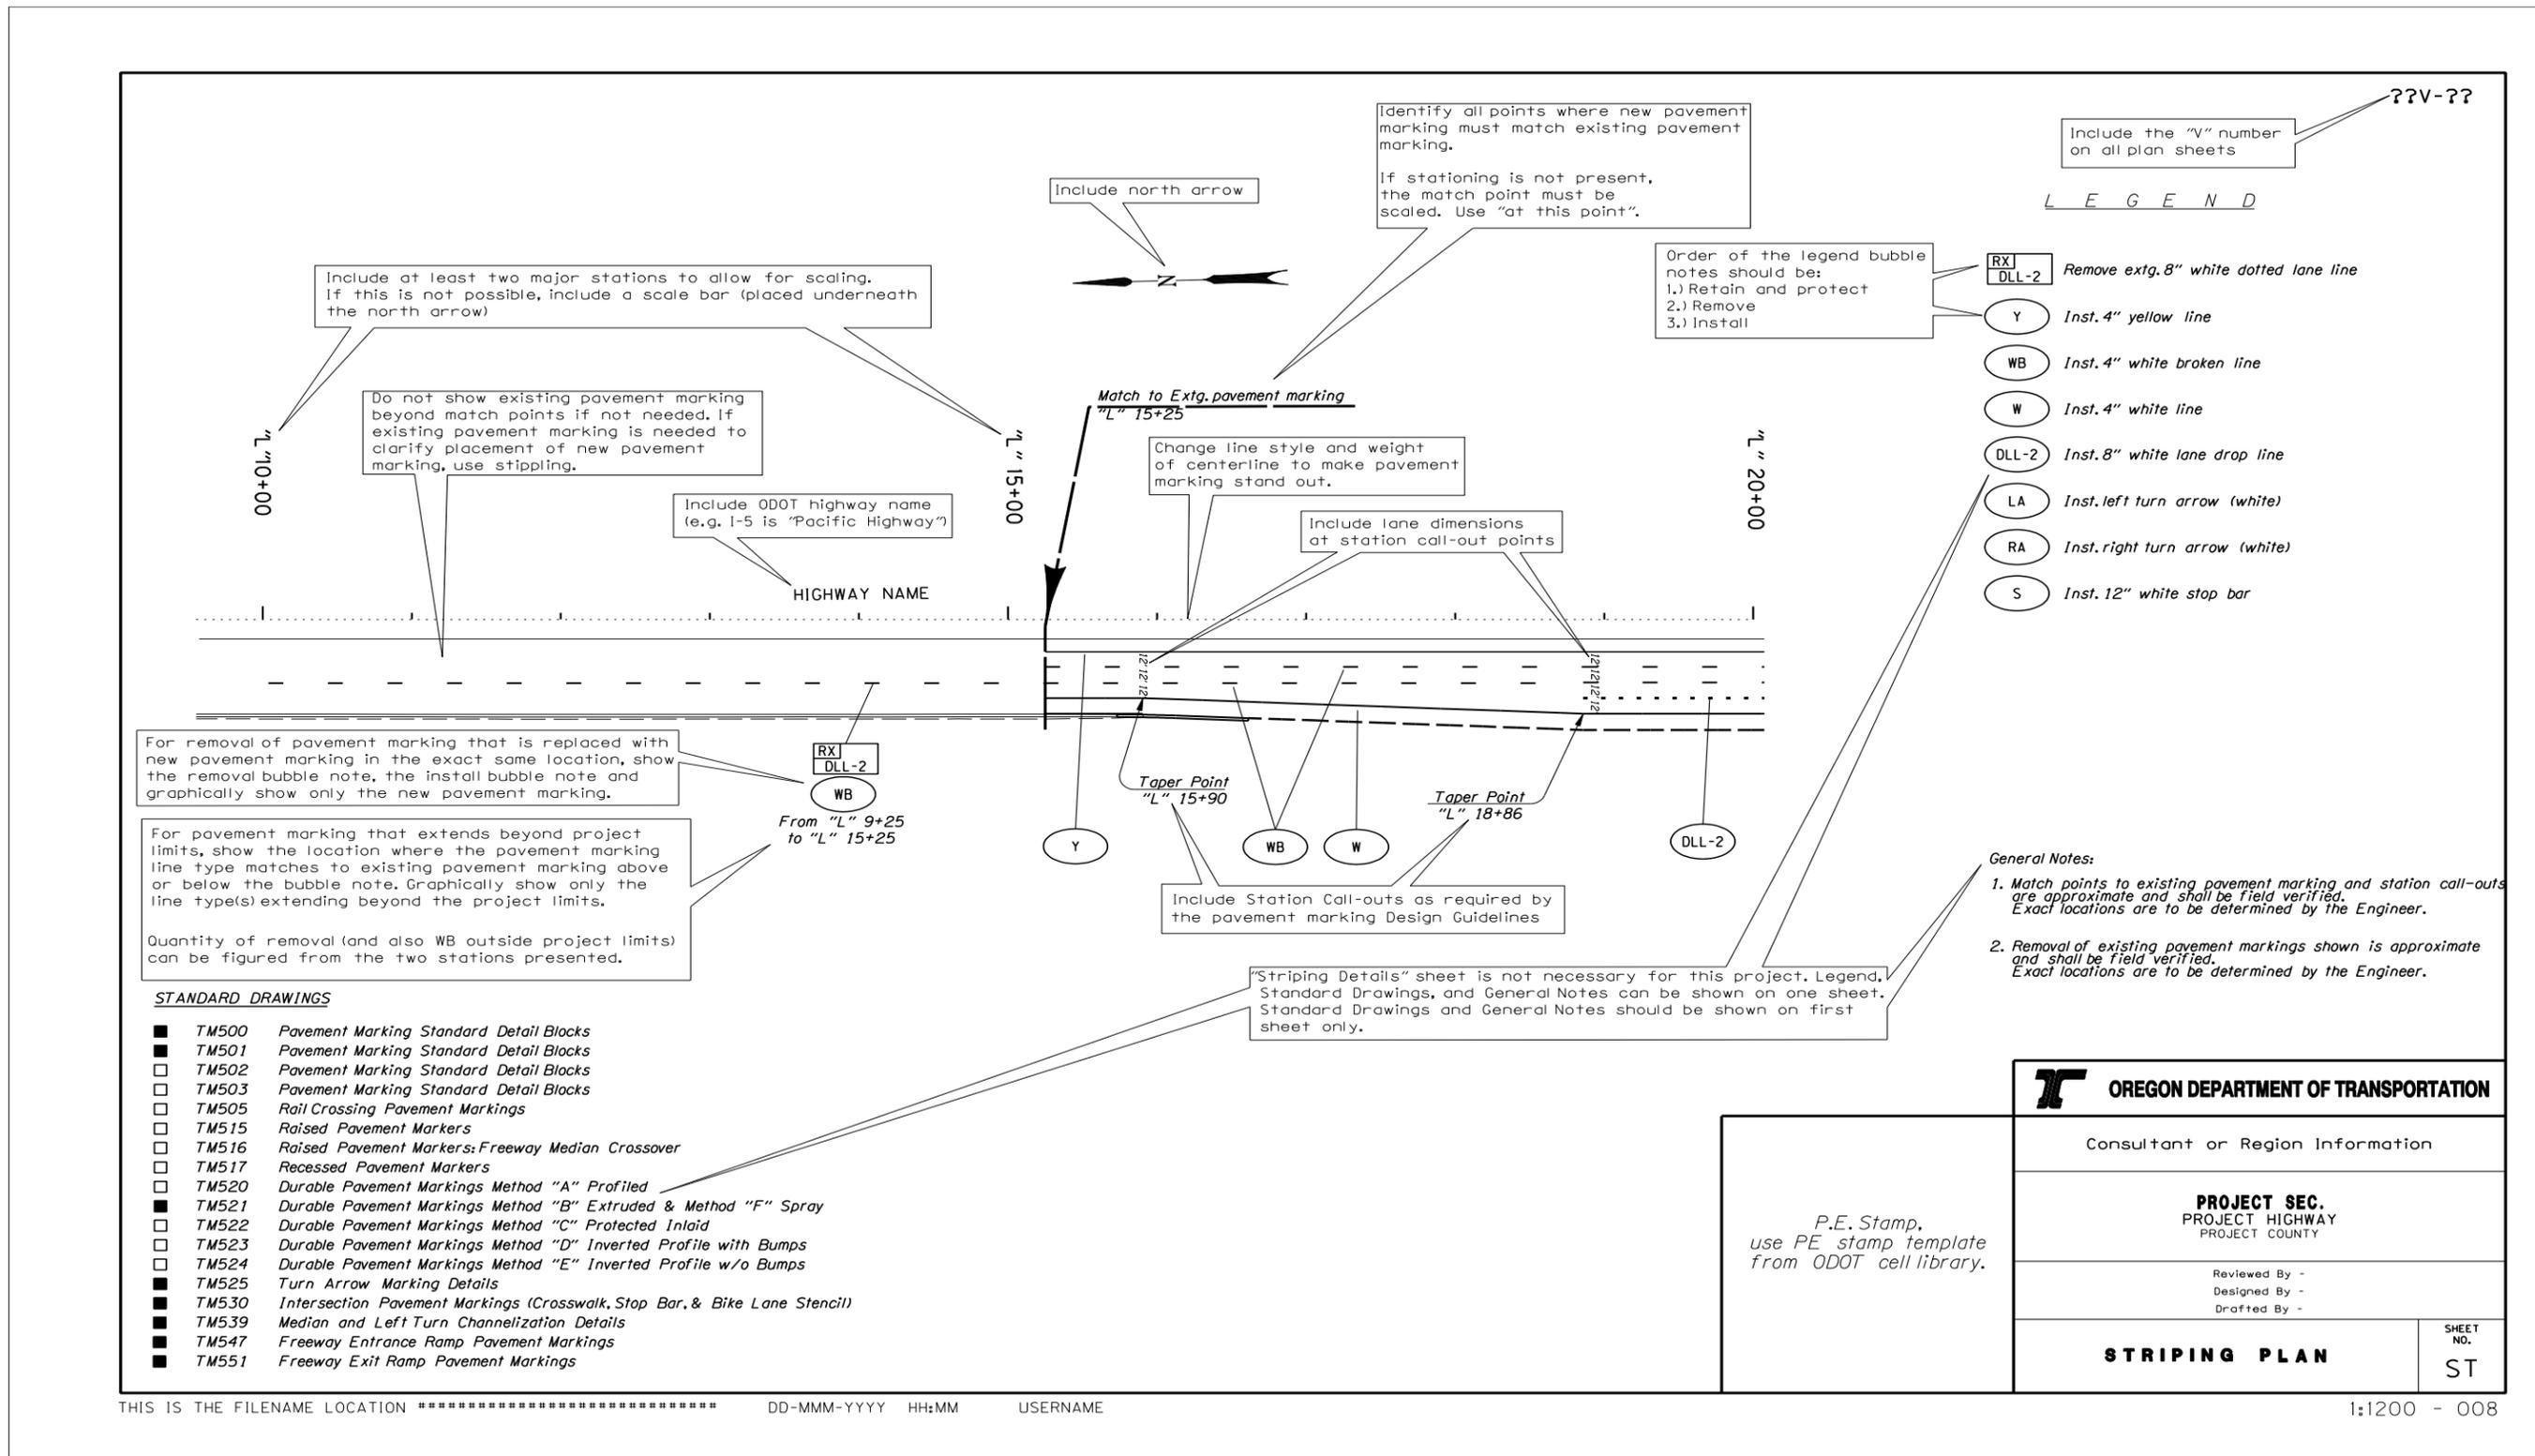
Striping Plan Sheet When a Striping Details Sheet is Not Used (3)
